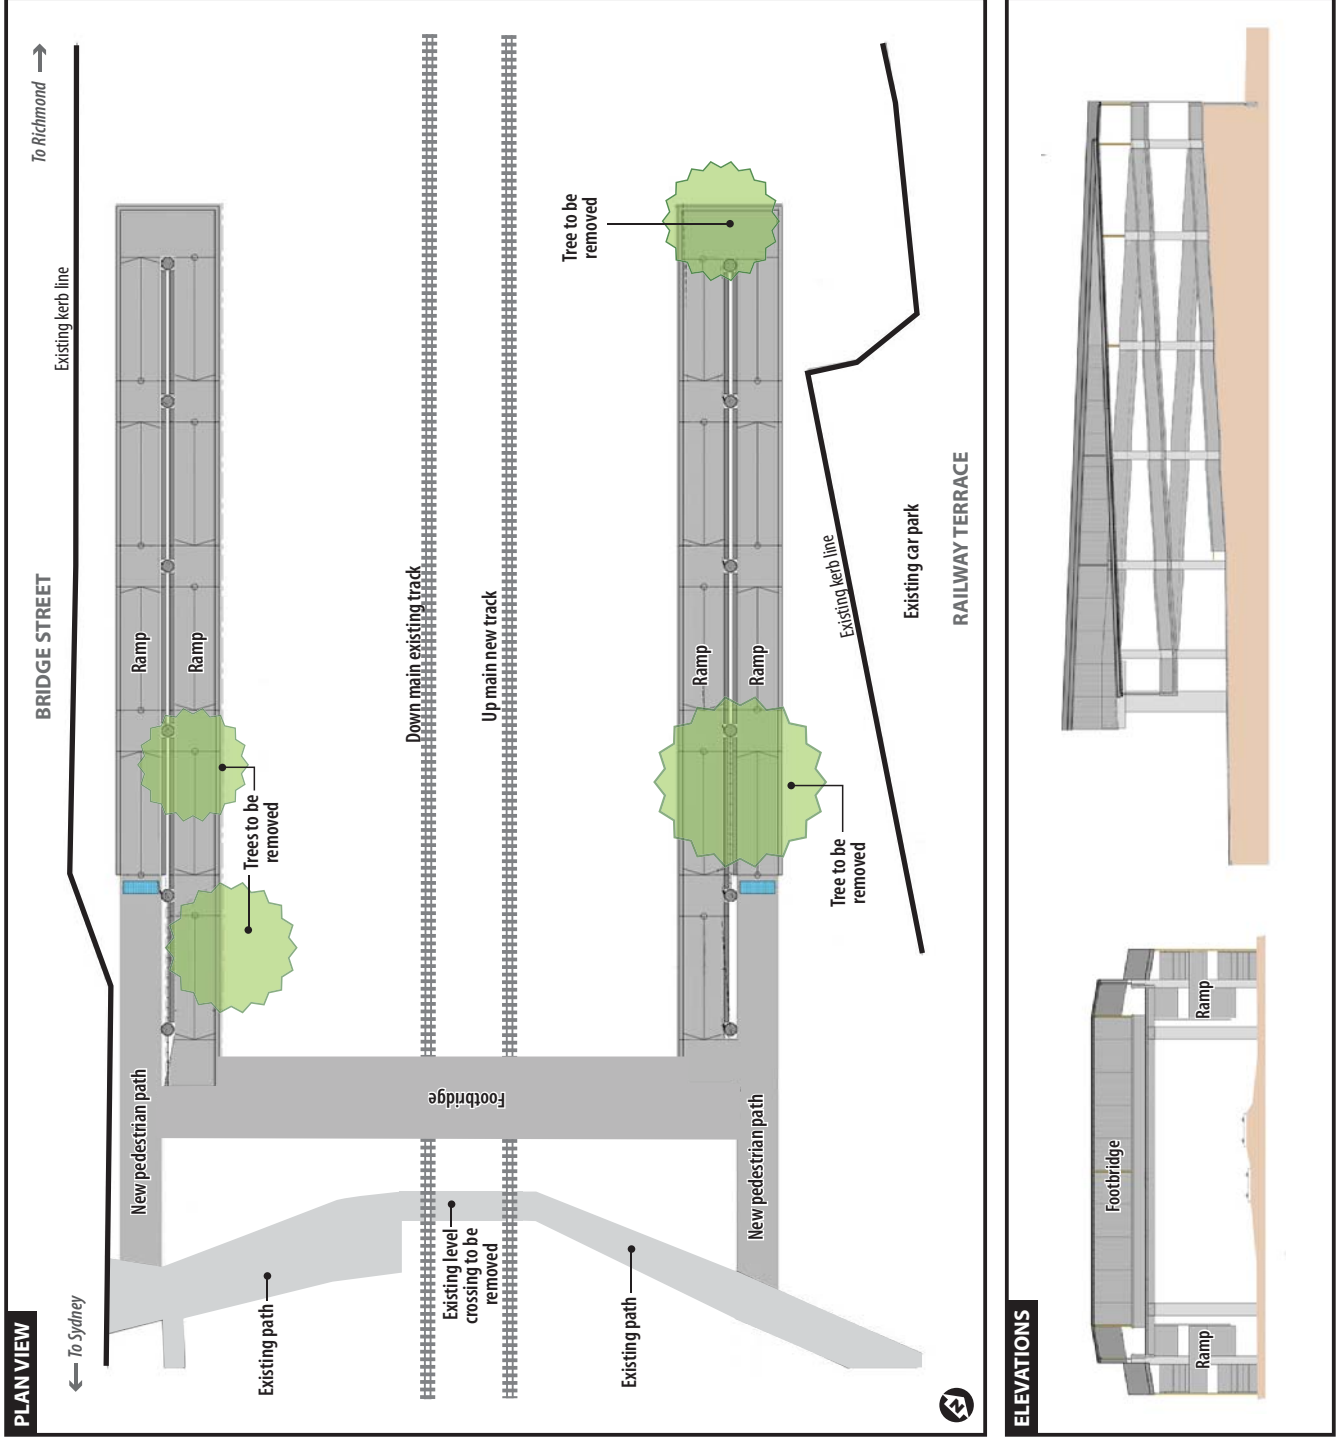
Schofields Station pedestrian overbridge (plan view and elevations)
